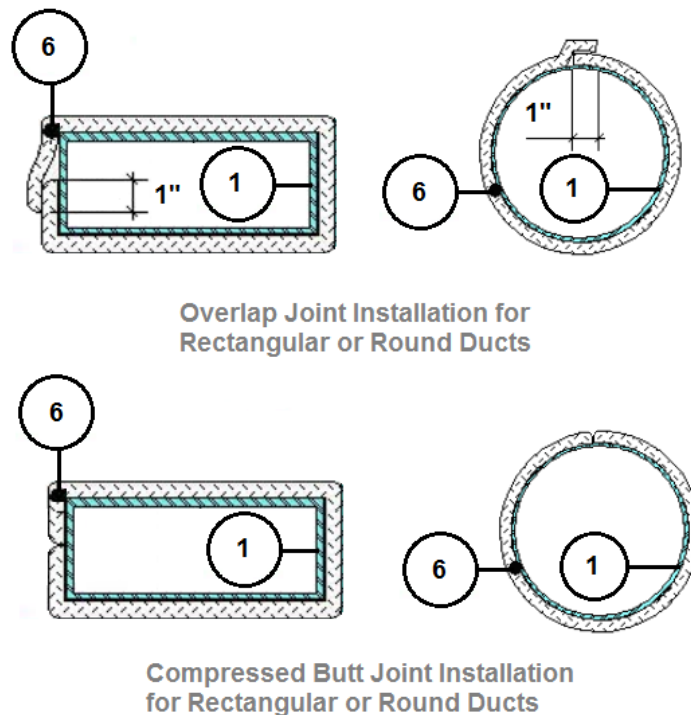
3M™ Fire Barrier™ Dryer Ventilation Wrap
